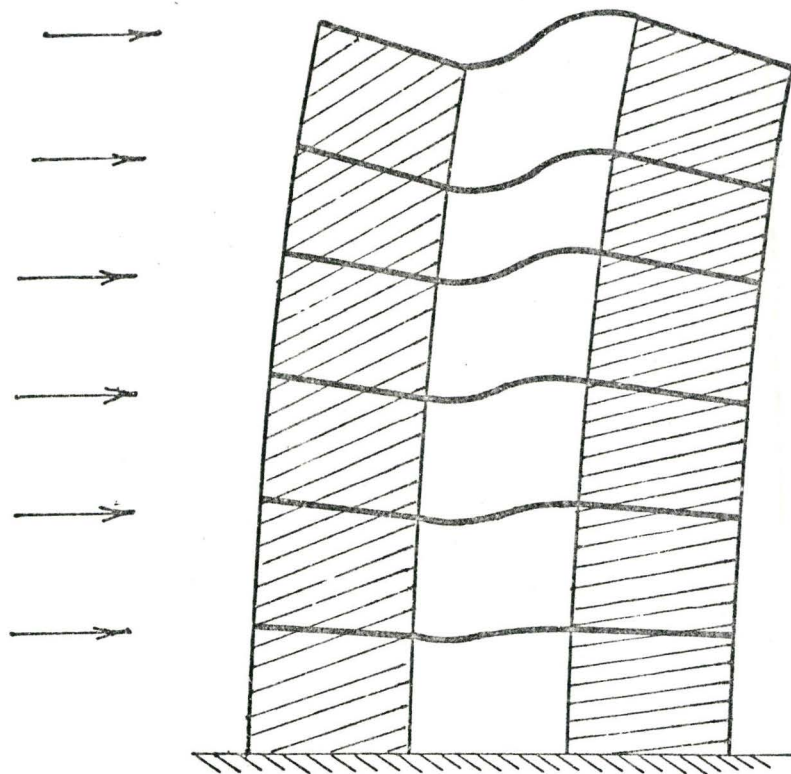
Deformation of Cross Wall Structure Under Lateral Loading.
